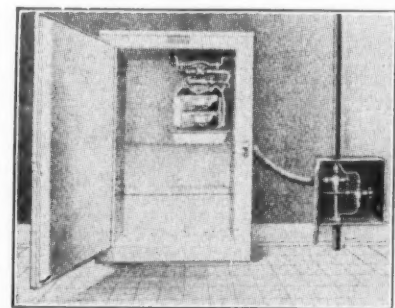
Box of a multiple installation with conduit not concealed in wall.
